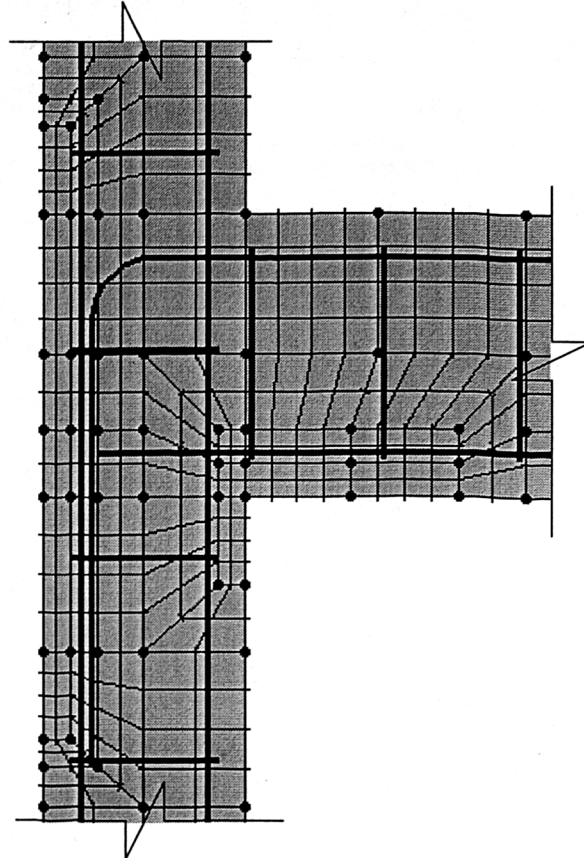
The mesh layout for a typical model using bent down beam steel
